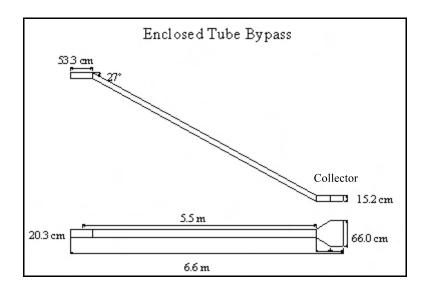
Dimensions of the closed tube bypass design (side view above and top view below) installed at the Bradford Island MWC in 2002.
